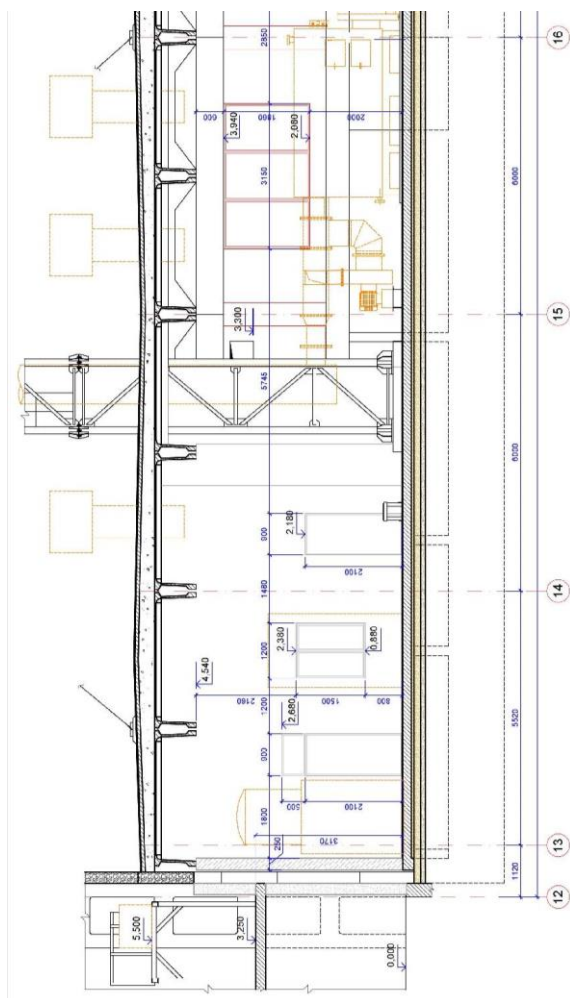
Longitudinal section of the building after reconstruction "2-2"
